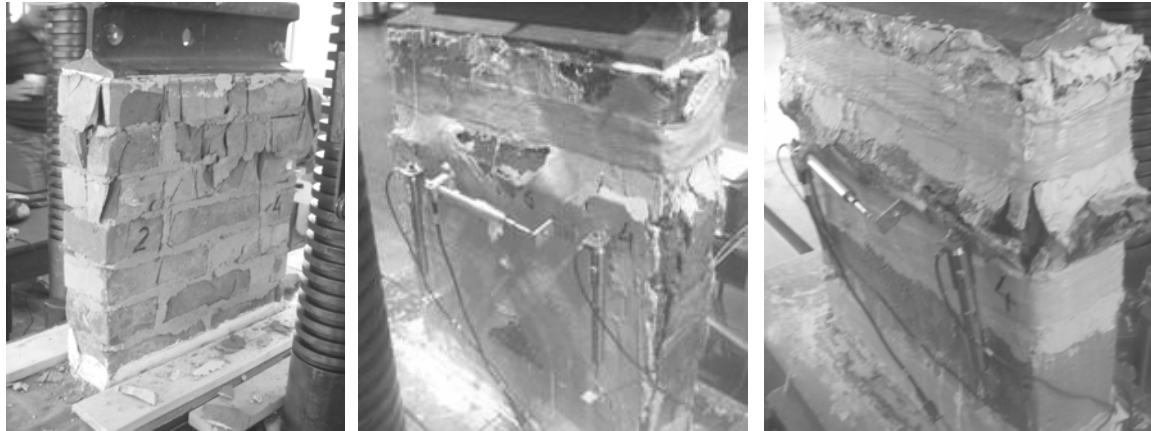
Specimens at failure due to vertical compression load. Specimens from left to right: unstrengthened; strengthened with diagonal straps; strengthened with horizontal straps
